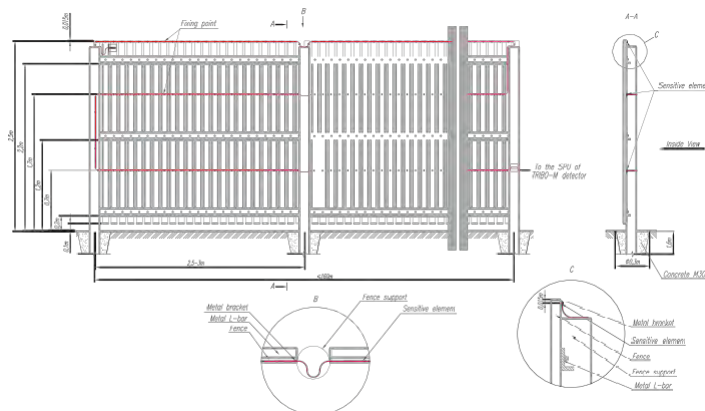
SENSITIVE ELEMENT LAYOUT ON WOODEN FENCE
